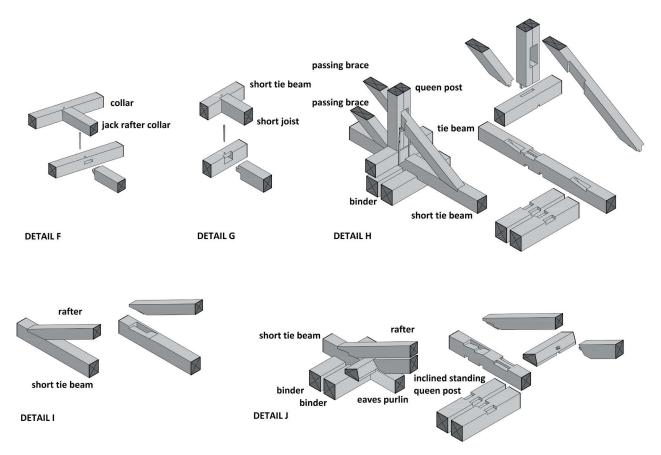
Leszno, Church of the Holy Cross, roof structure, construction details (elaborated by U. Schaaf, M. Prarat)
